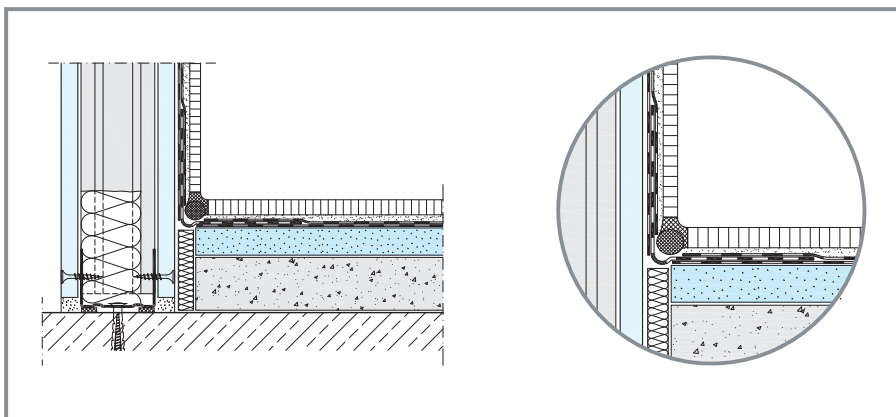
Floor sealing in damp areas, example prefabricated screeds
